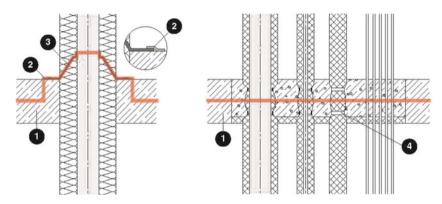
Pipe penetration: (1) ceiling, (2) tape, (3) sleeve, molded part, (4) cable tie
